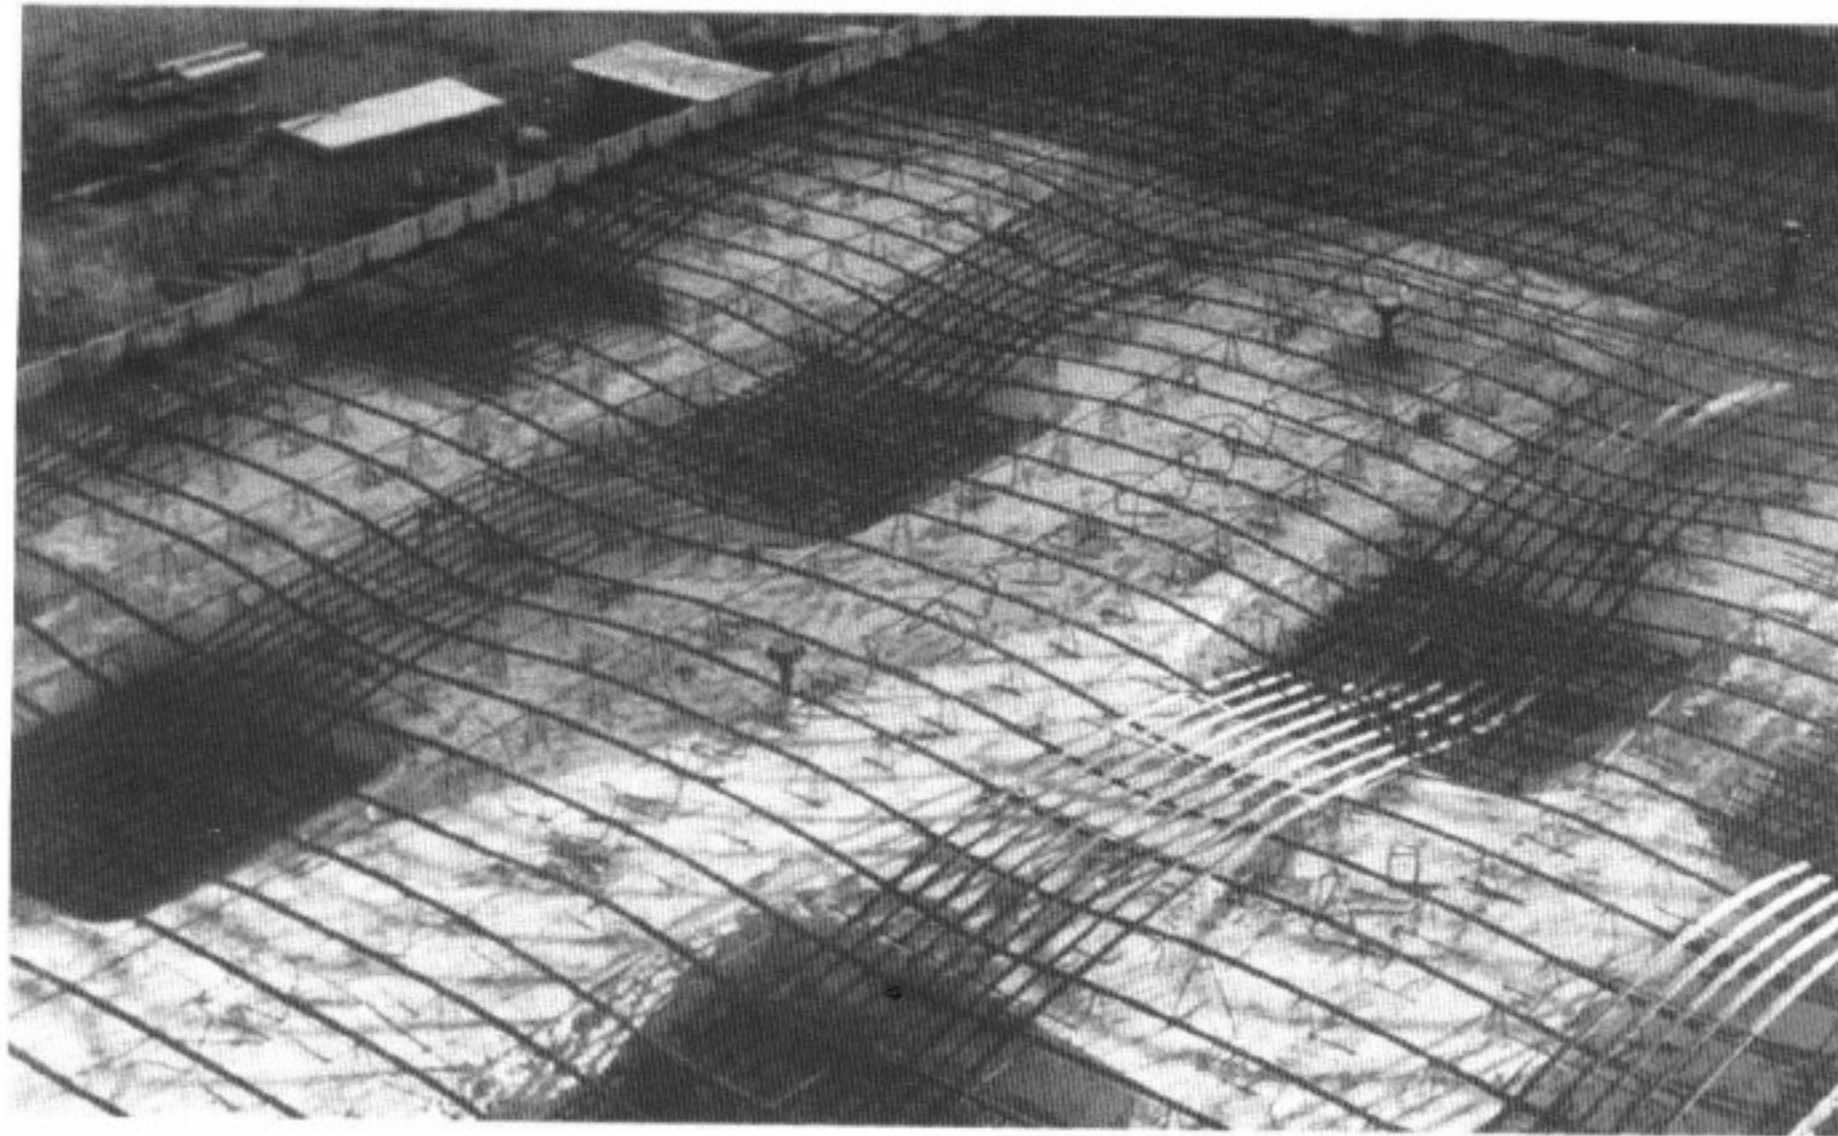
A Post-Tensioned Raft Foundation under Construction
